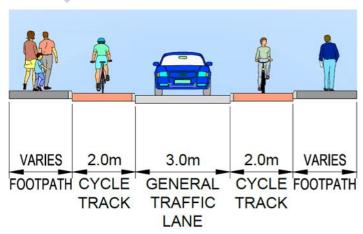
Section 2, Proposed Option 3 - Cross Section B-B
